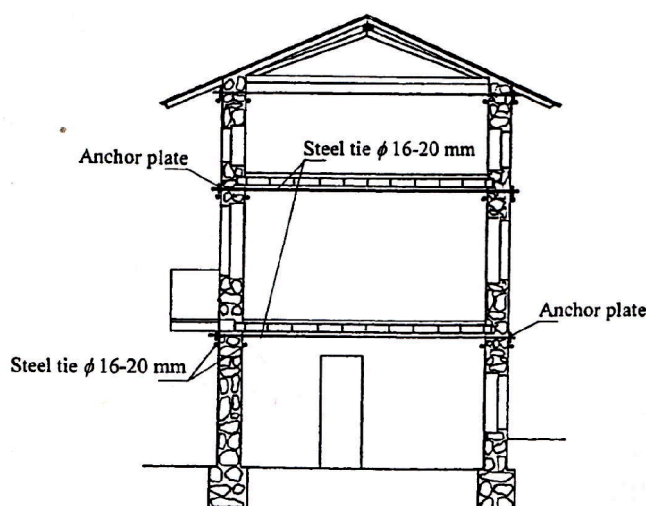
Position of steel ties in elevation of a rural stone-masonry house [21]
